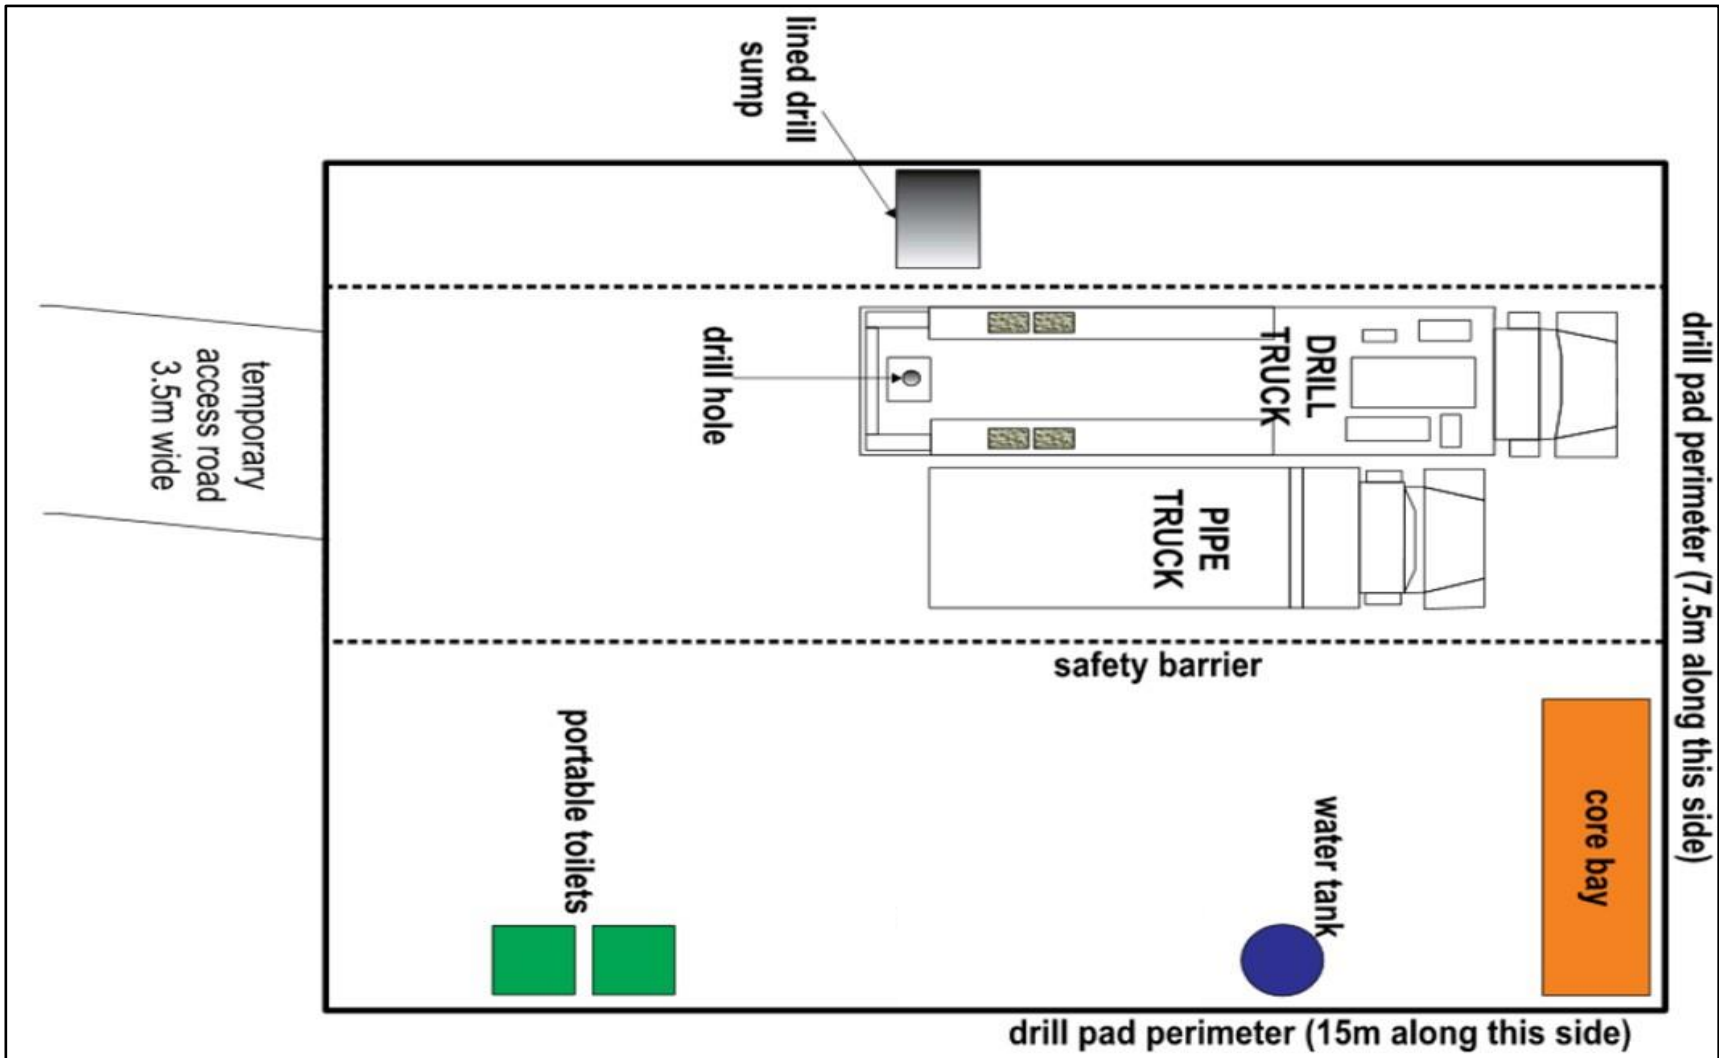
Showing equipment's and space that will be utilized on the drilling site
